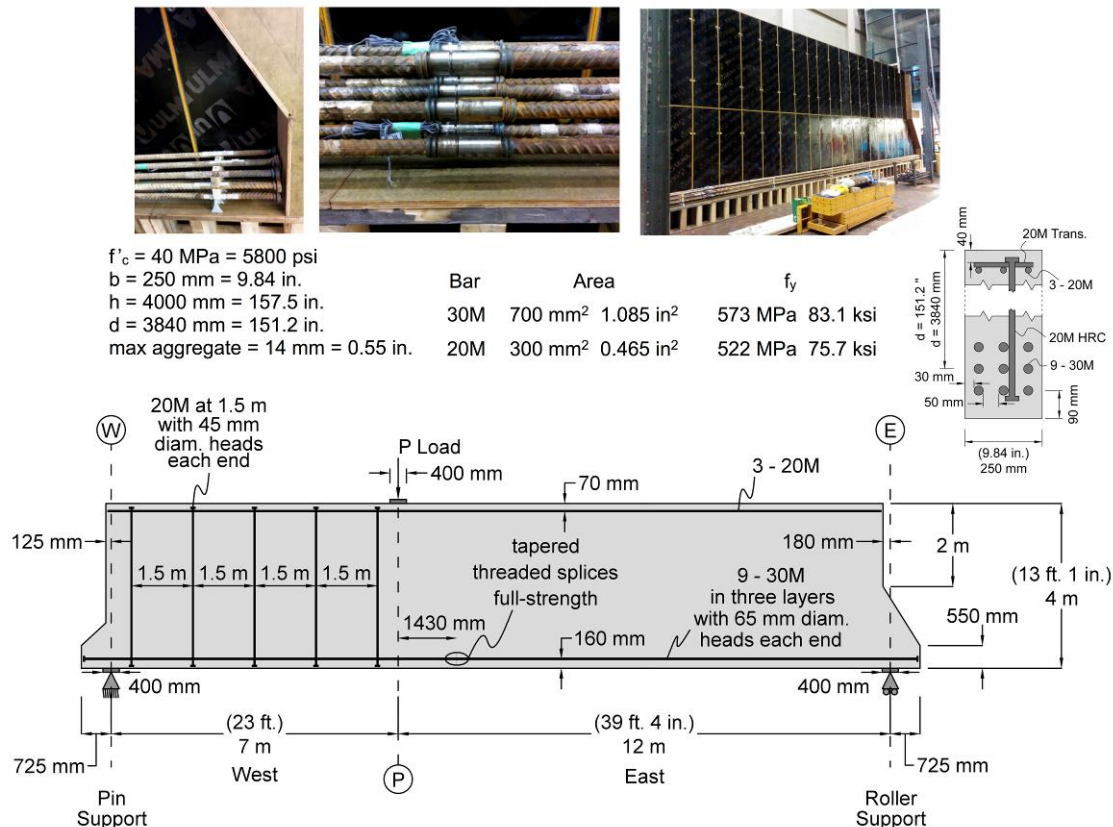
Details of the 4 m thick slab strip specimen PLS4000
